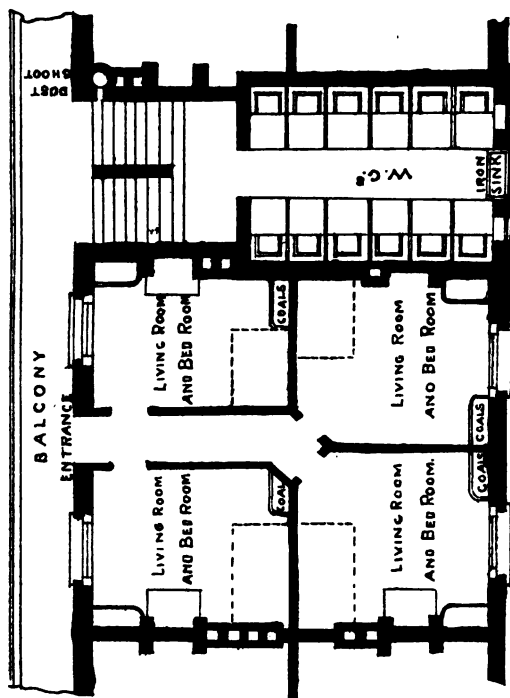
FIG. VII. South London Dwellings Company Limited, Kennington Road, South Lambeth. (Tenement Plan).
